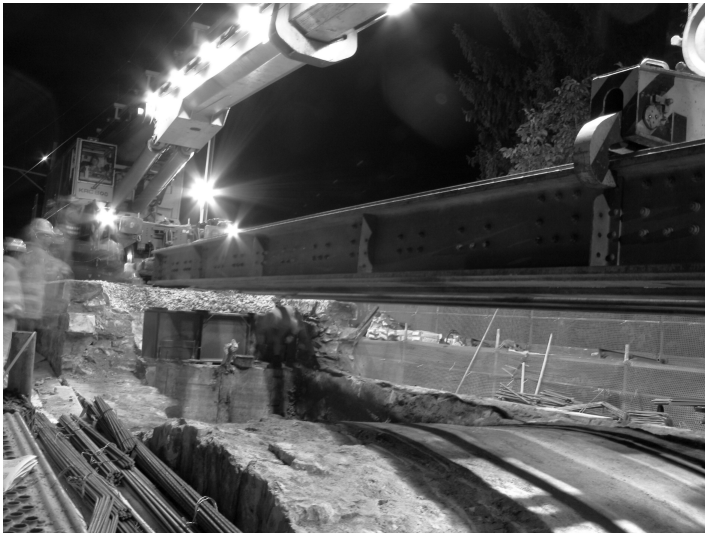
Installation of a temporary bridge above an exposed natural stone arch
